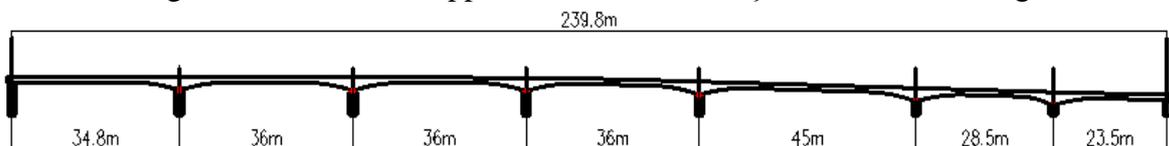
North-east approach viaduct at Haliç Metro Access Bridge.
